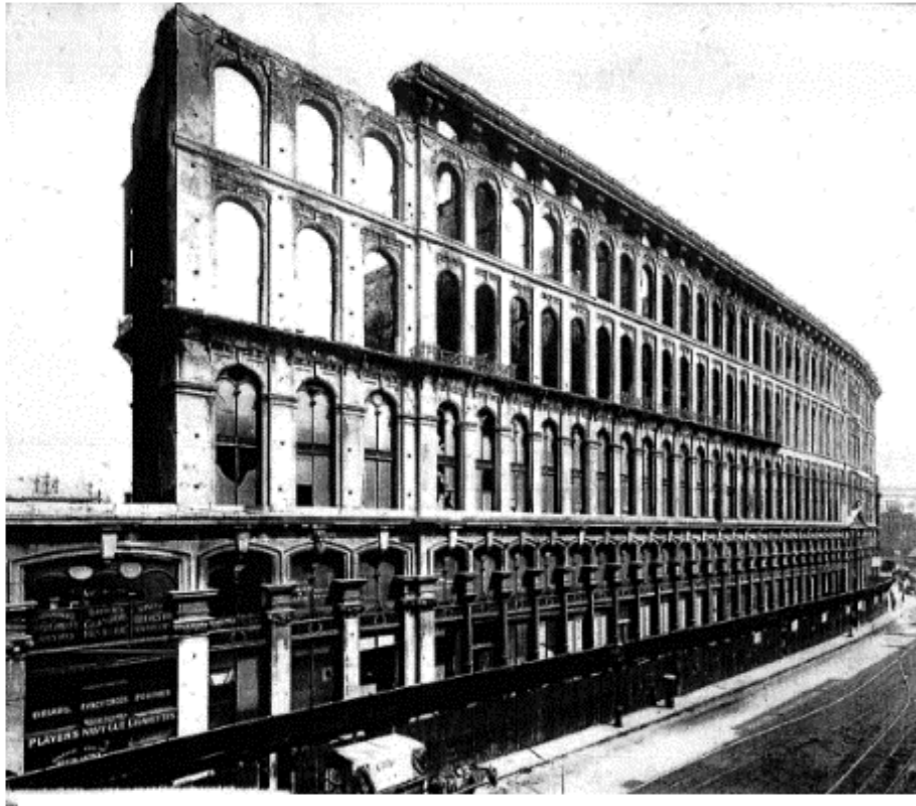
1921 – Front elevation following fire damage of 20th October 1920
